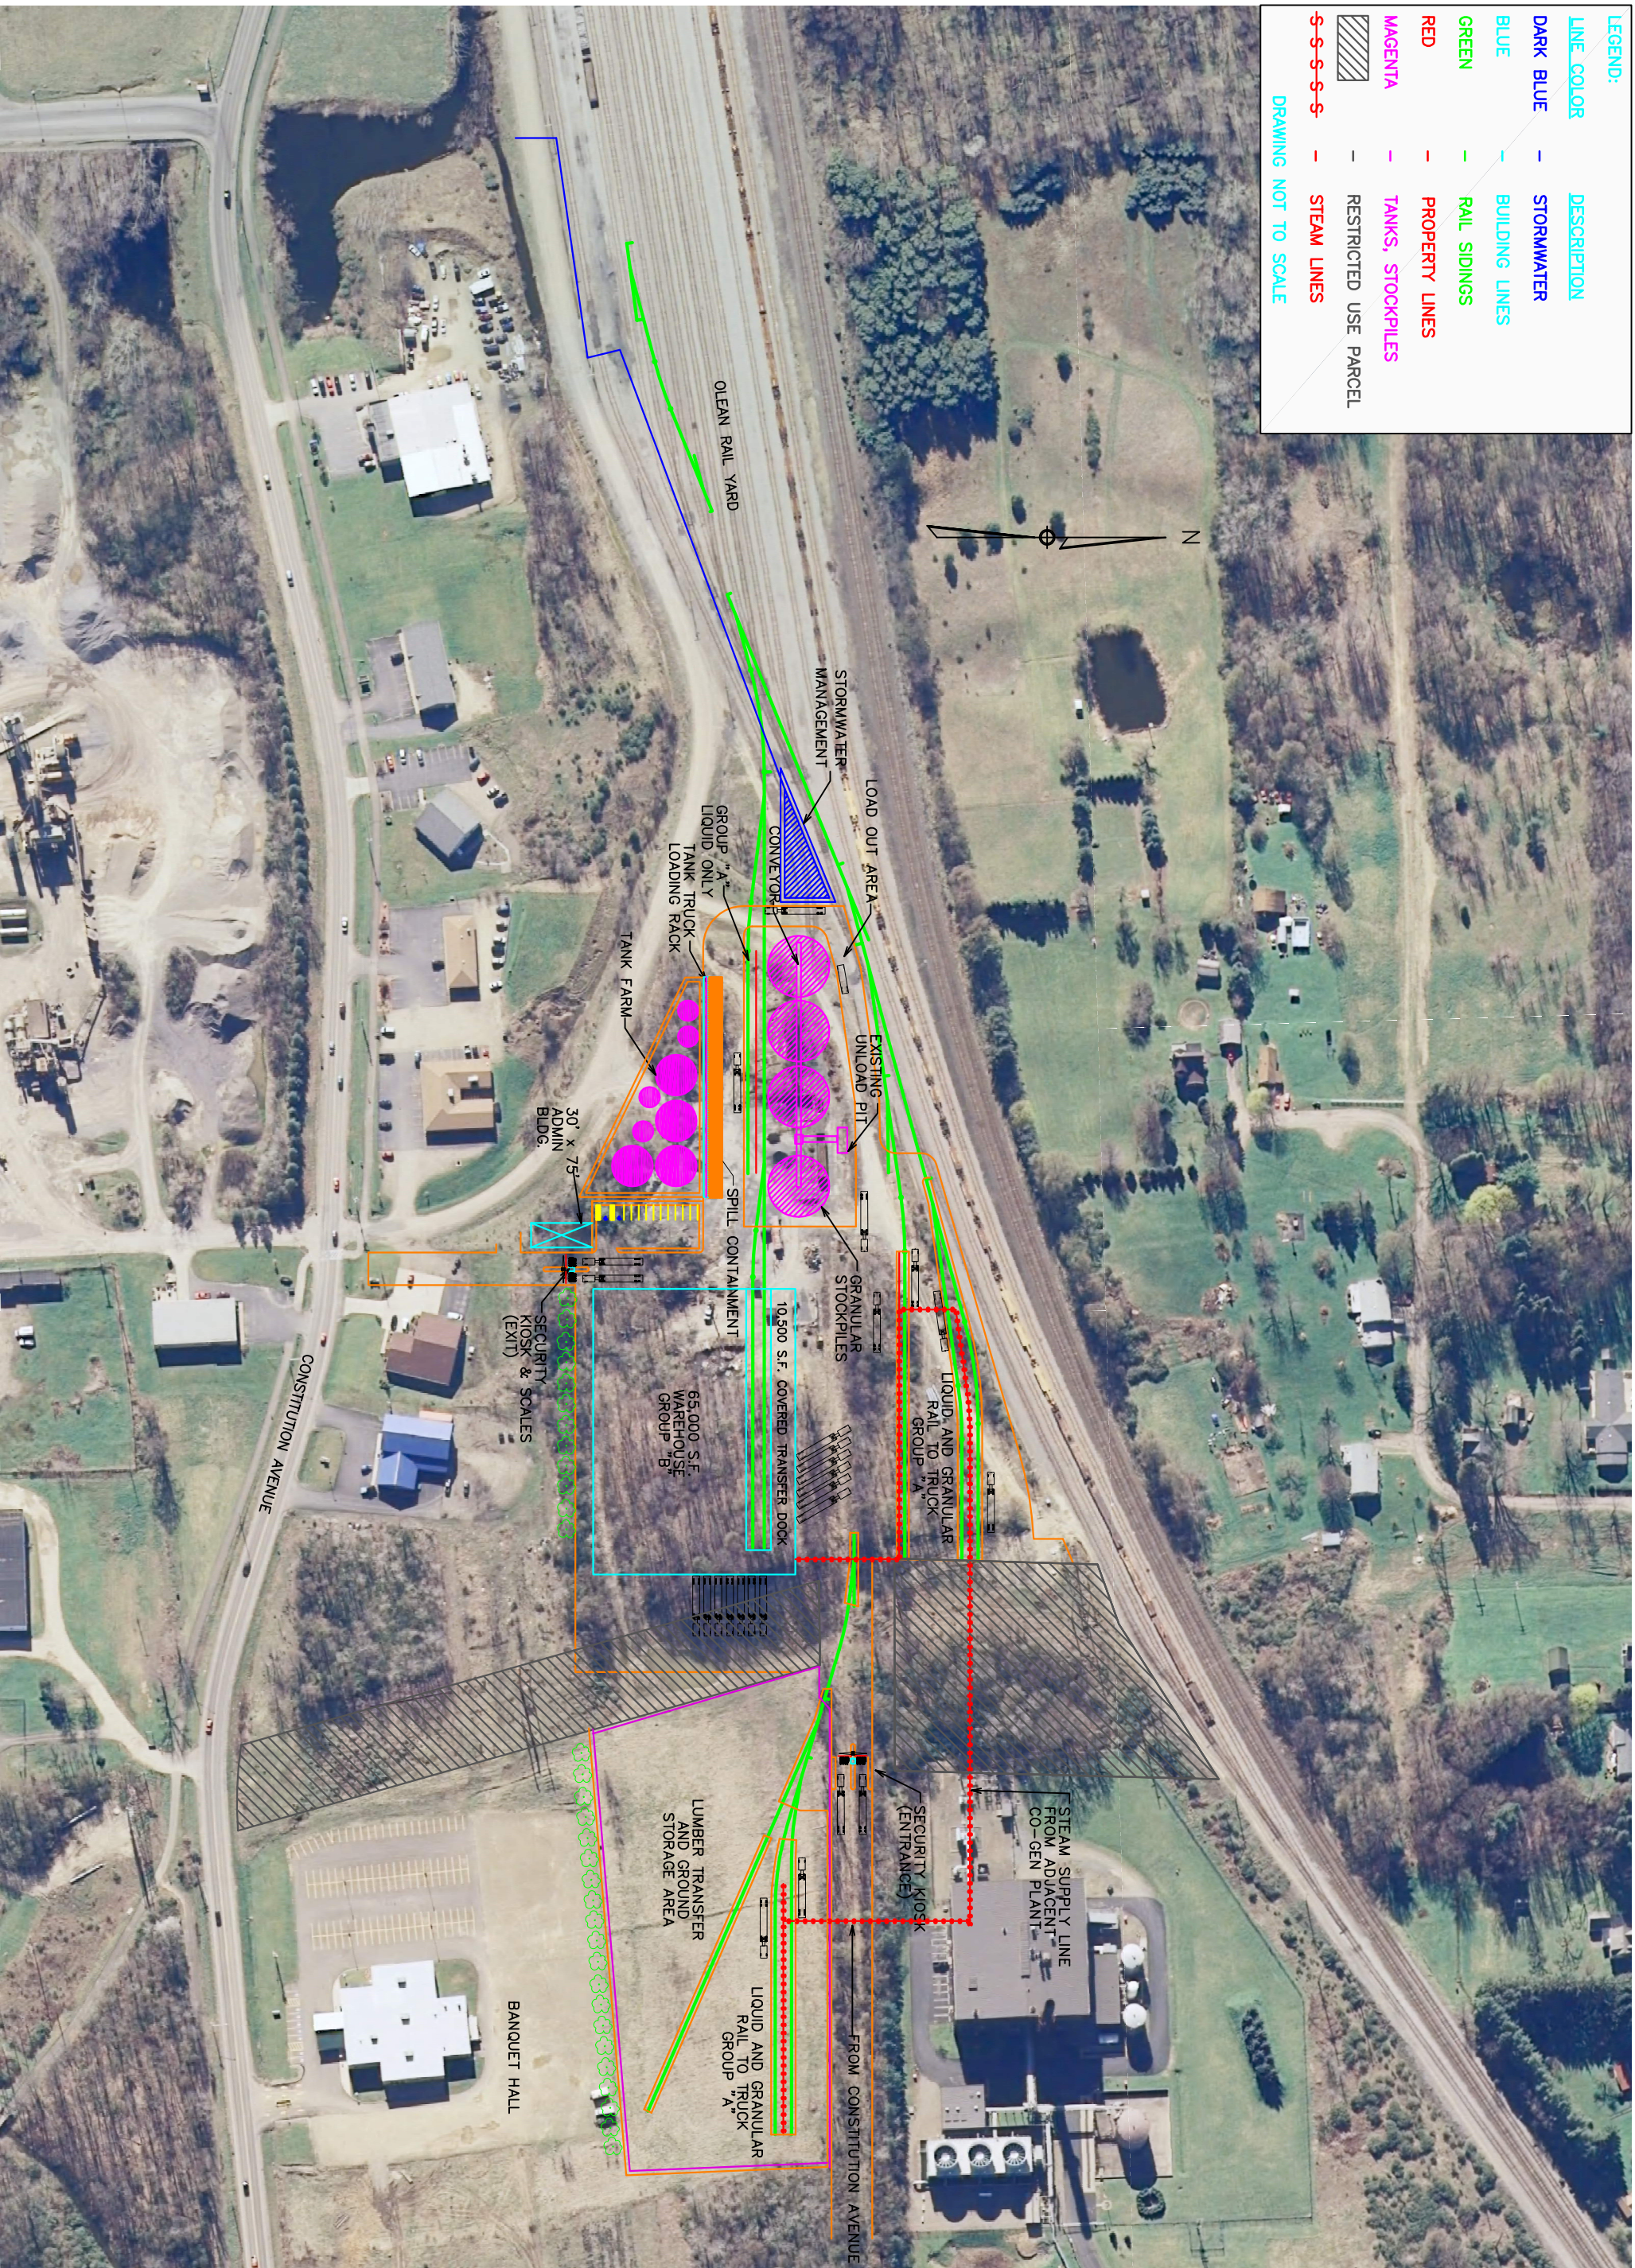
CONCEPTUAL SITE PLAN OPTION #3
